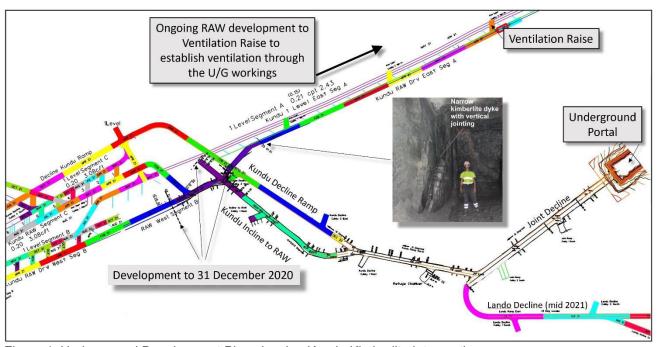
Underground Development Plan showing Kundu Kimberlite intersection
